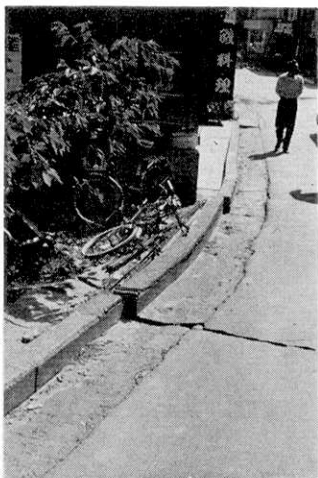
Paved road damaged on the fault line at Loc. 6.
